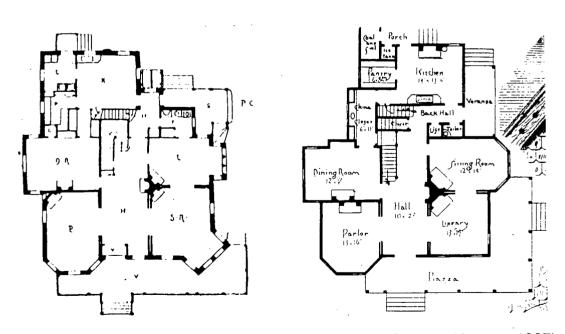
Palliser Co., Plans, Design 1 and 16 (New Cottage Homes, 1887).
